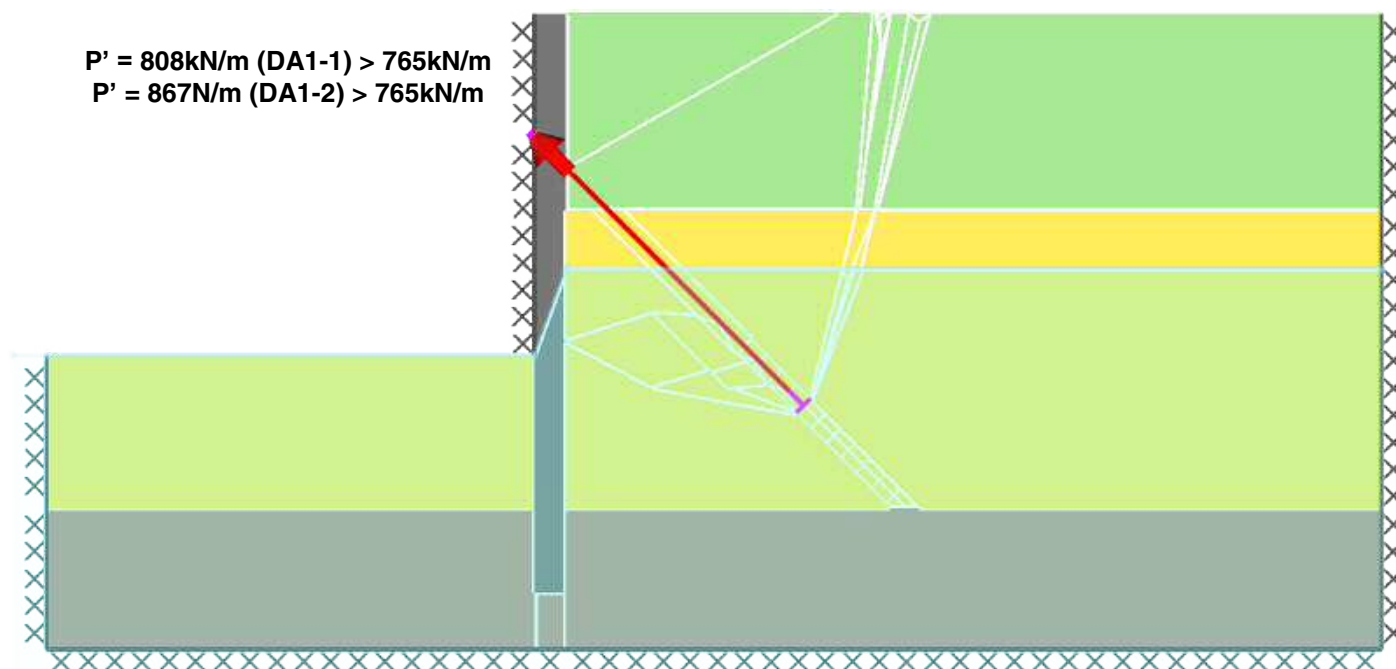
DC3a Pull-out failure - Inclined anchor pull-out capacity for 9m length
